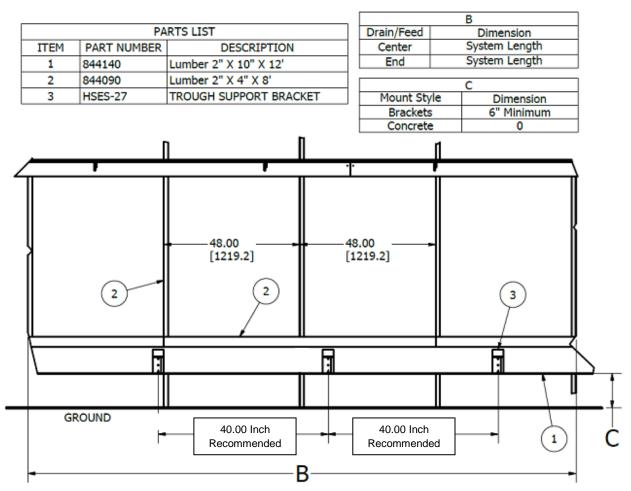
above shows the typical spacing for 2"X4" studs during framing along with typical spacing for the Trough Support Brackets (If Applicable). Table B and Table C provide the total framed opening requirement and minimum distance from the ground to the base of the Trough Support Bracket respectively.
